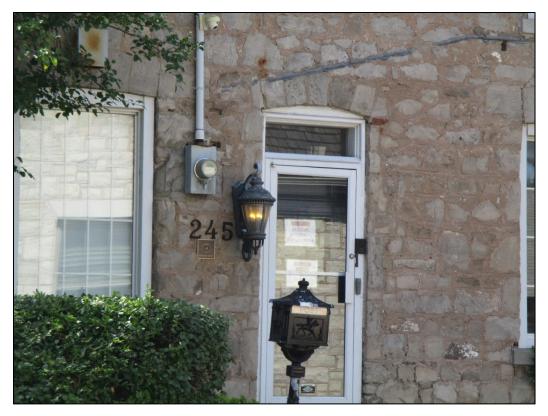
and 14: Masonry details of the eastern gable of the south elevation
